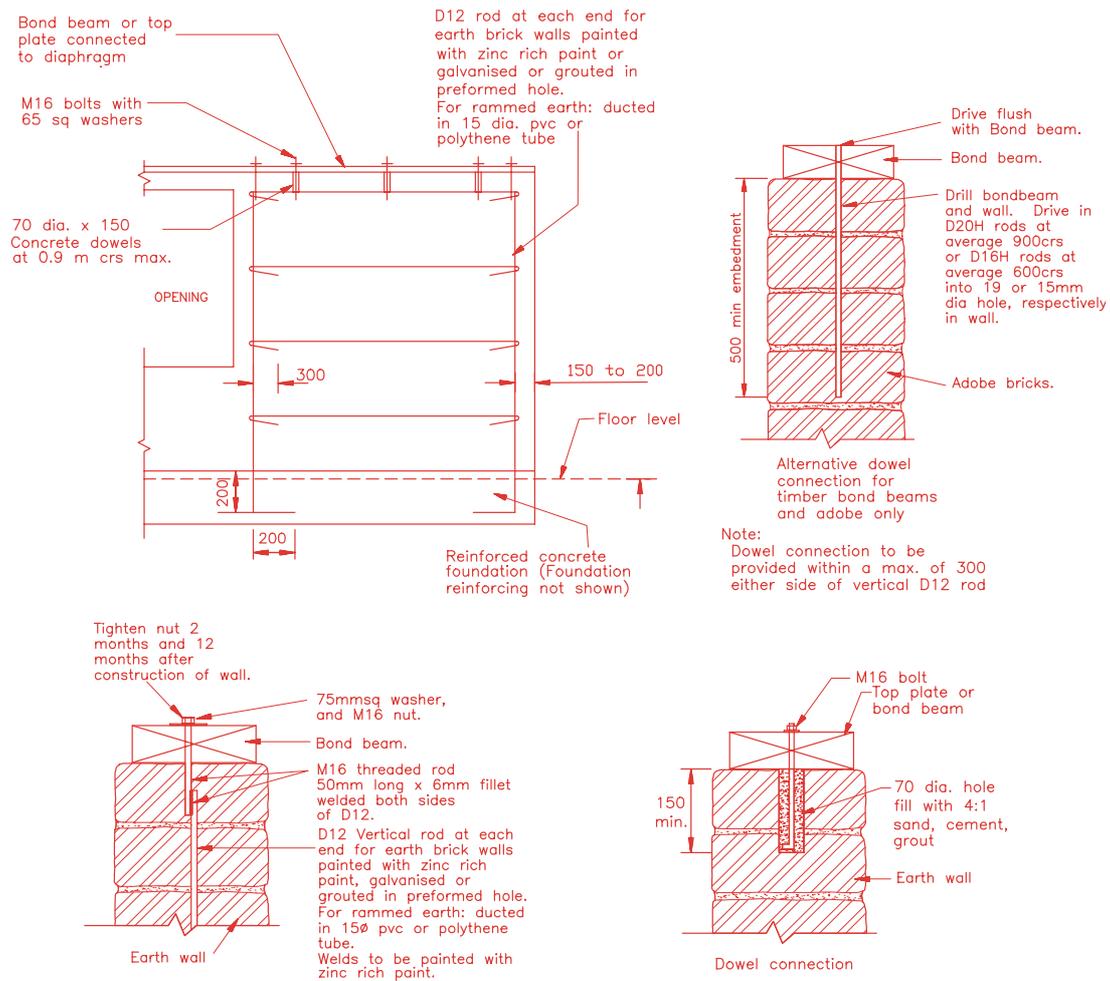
Typical reinforced wall detail from NZS4299 – Polypropylene geogrid is also used horizontally
